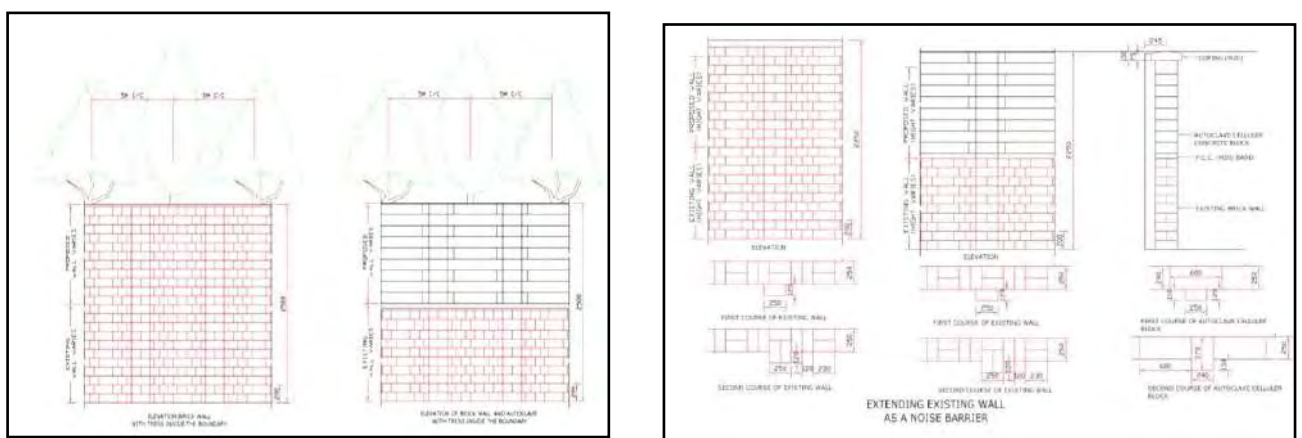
Cross section of the Boundary wall (Noise Barrier)
